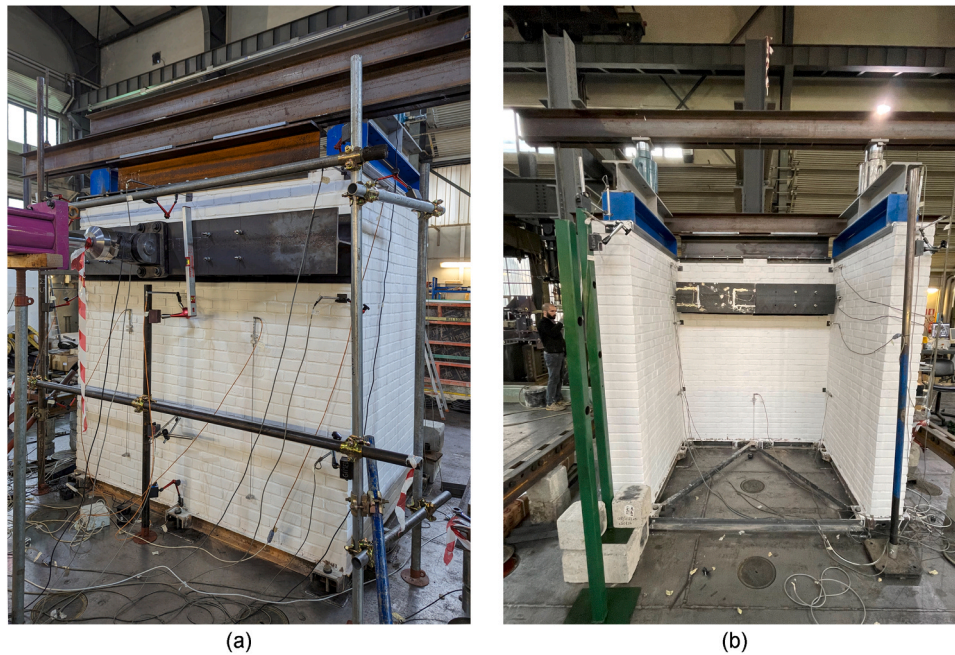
Front view (a) and back view (b) of the specimen with the test set-up.
